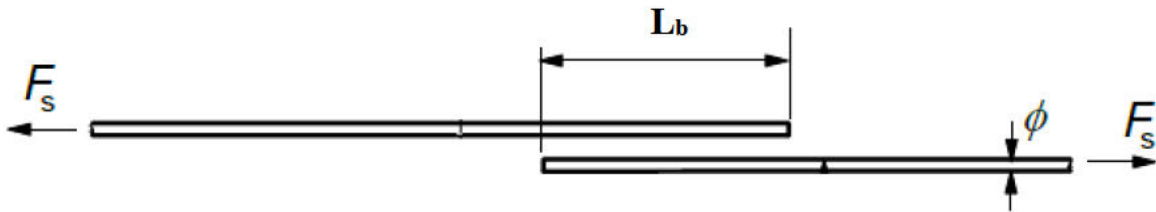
Straight lapped reinforcement (modified from BS EN1992-1-1:2004)
